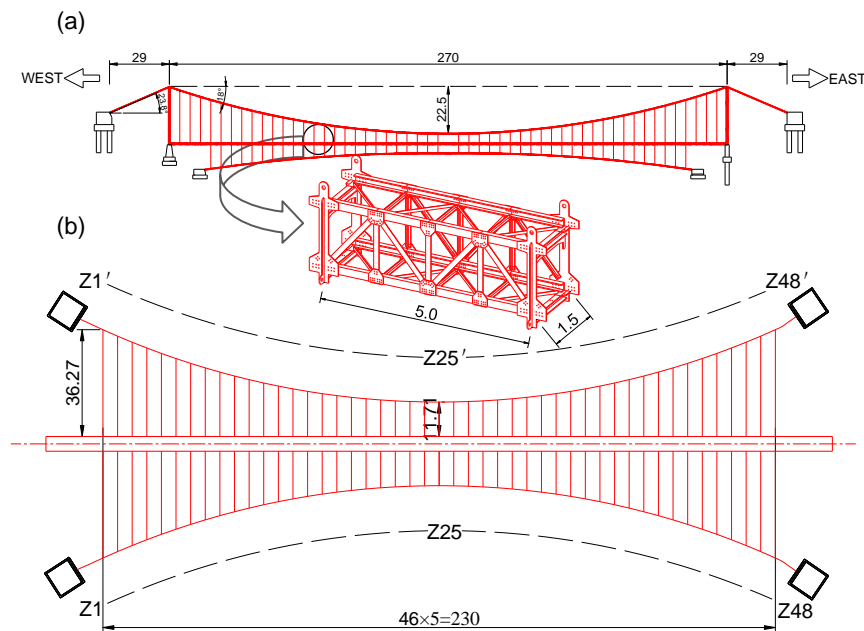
Bridge Layout (unit: m) (a) Elevation; (b) Wind cable plan
